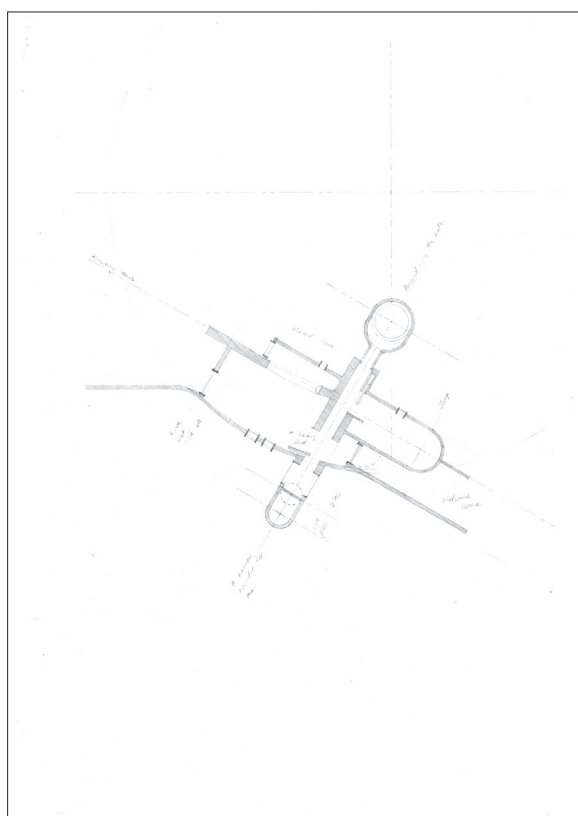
House plan establishes the basis for the roof plan, through a process of replication in light, delicate graphite lines.
